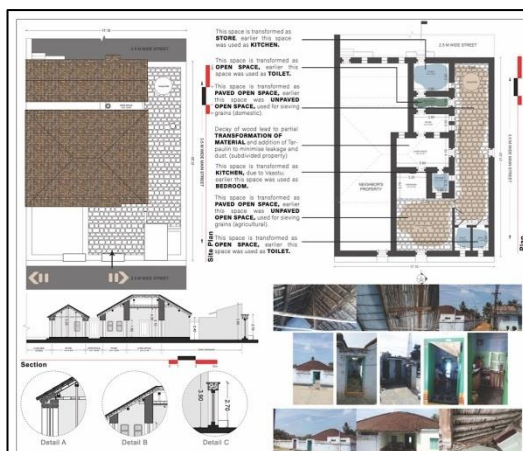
Plan, Site Plan, Section and transformations of House no. 5;
